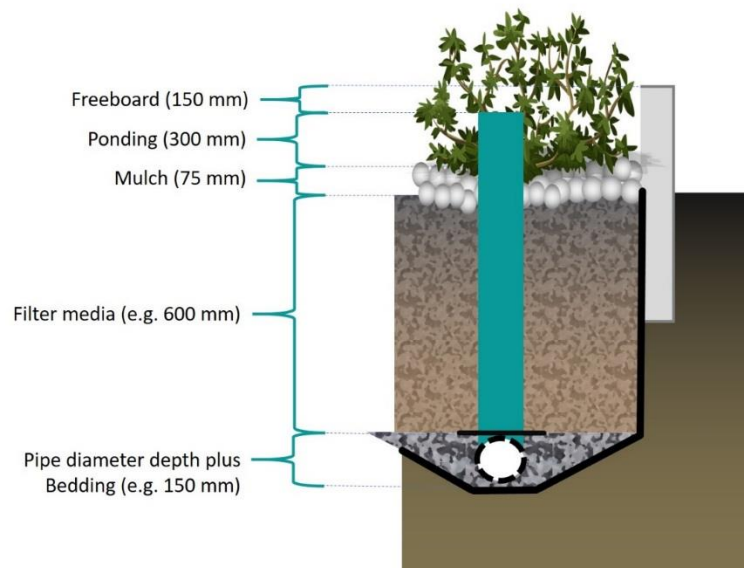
Sample stormwater planter cross section from “Raingardens: LID SWM Planning and Design Guide”
